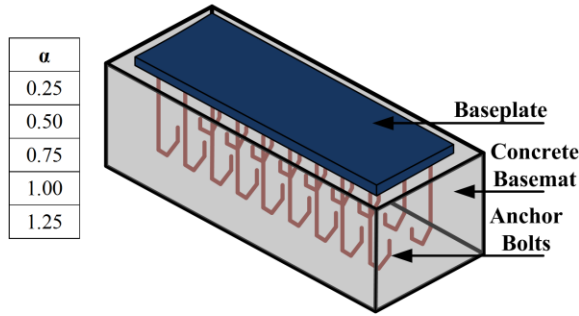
SC Wall Pier to Basemat Anchorage Showing Steel Baseplate and J-bolt anchors.
